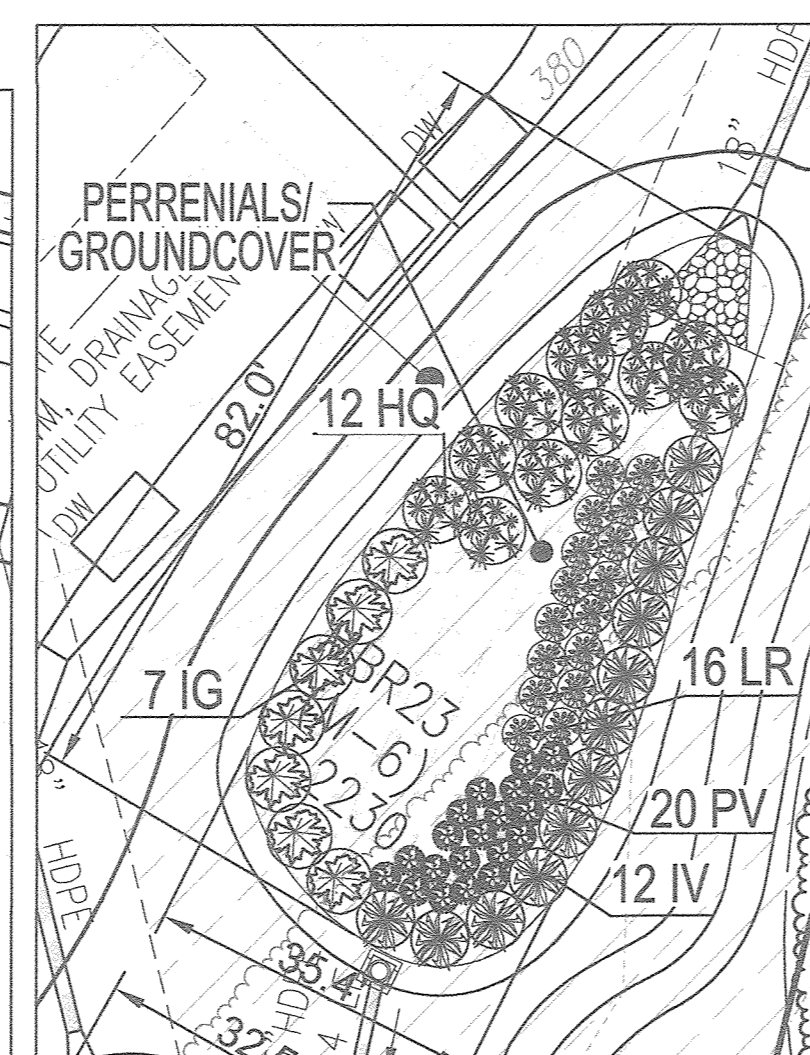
DETAILED BIO AND PLANTING PLAN (SWM #20)
